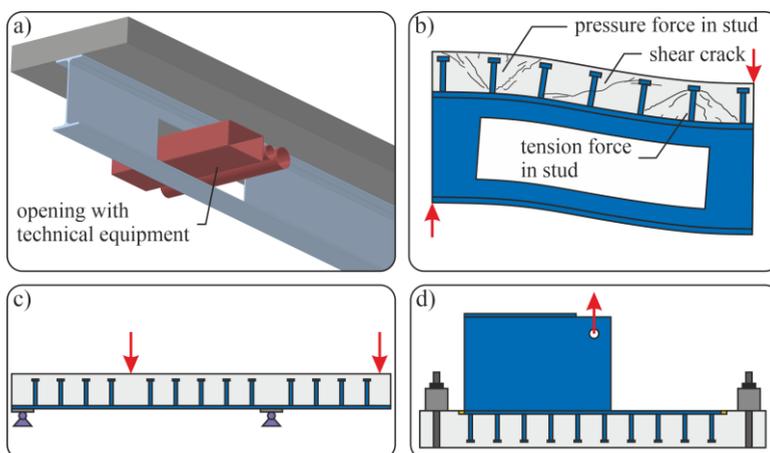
a) Composite beam with opening and technical equipment, b) local effects in opening area, c) test setup assessing the shear force resistance of the concrete chord, d) test setup assessing the number of headed studs involved in load transfer in the opening area
